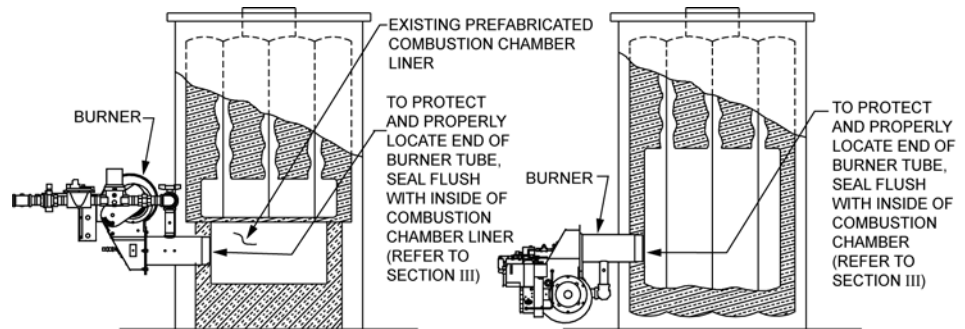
Dry Base Boiler with Combustion Chamber Liner (Warm Air Furnace Construction is Similar)
